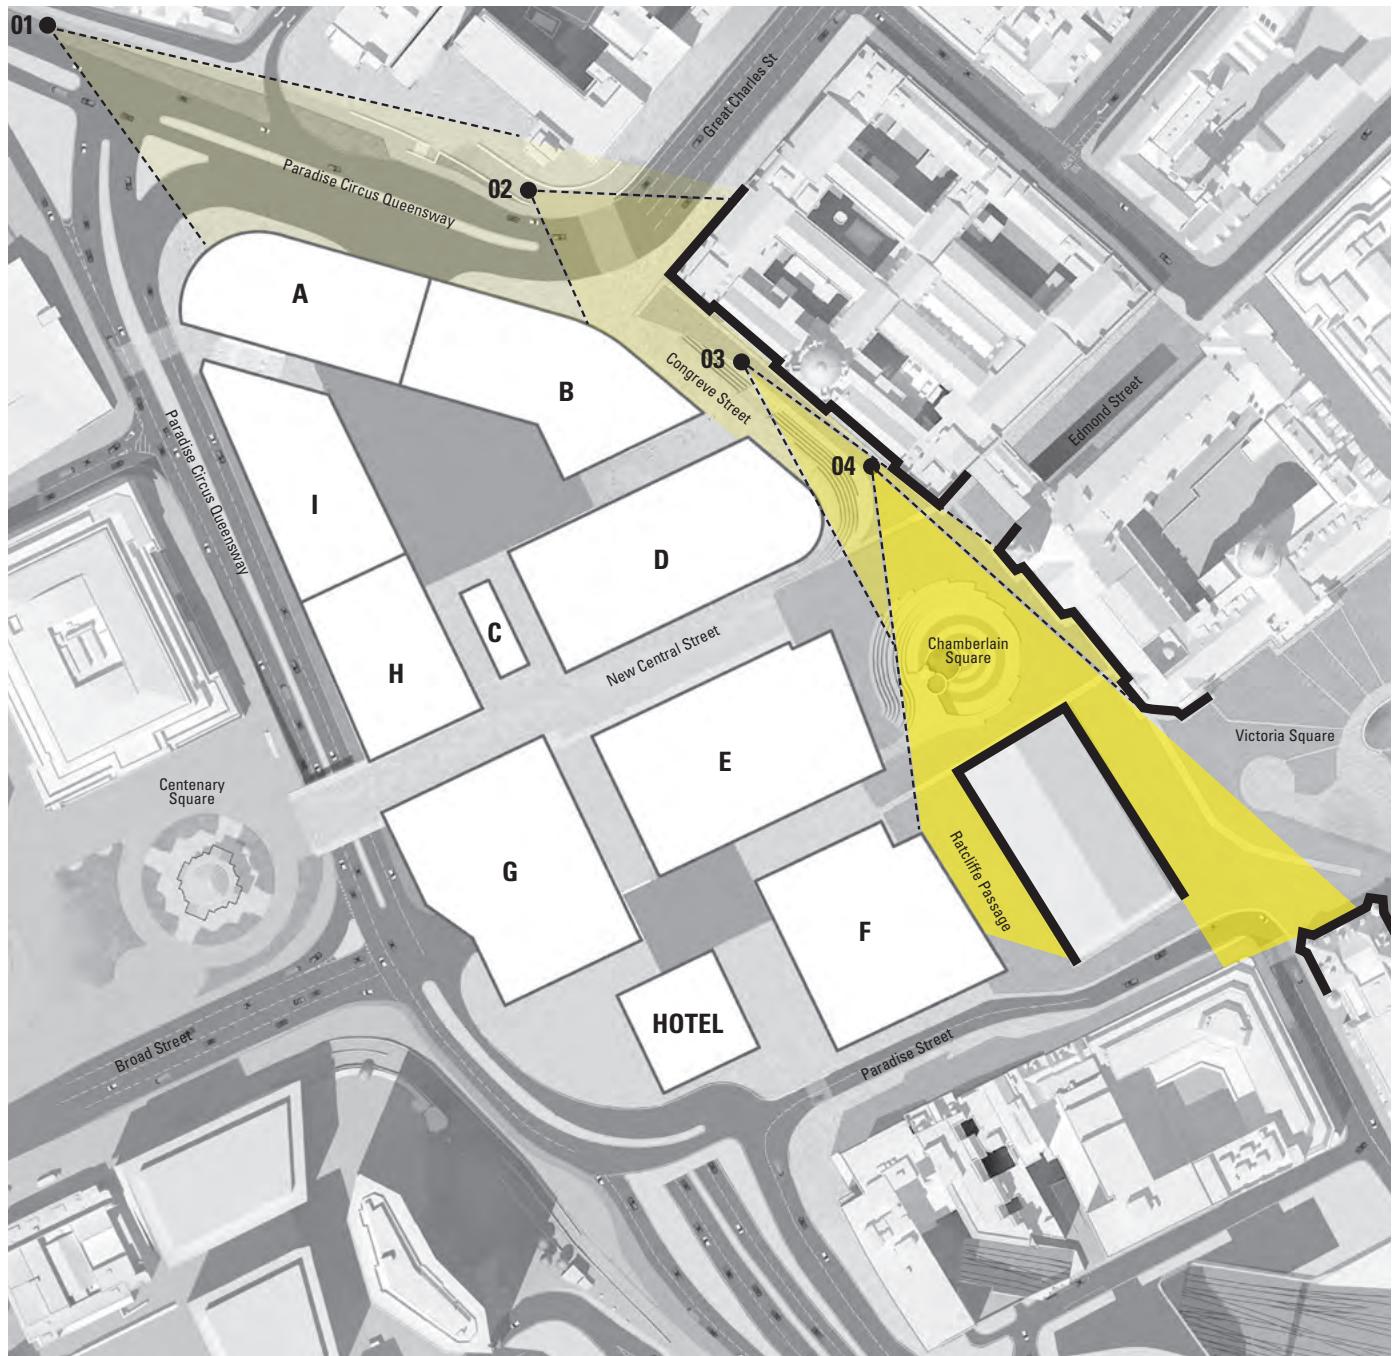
Illustrative Masterplan indicating the approach views from Summer Row/Paradise Circus Queenway to the Town Hall
